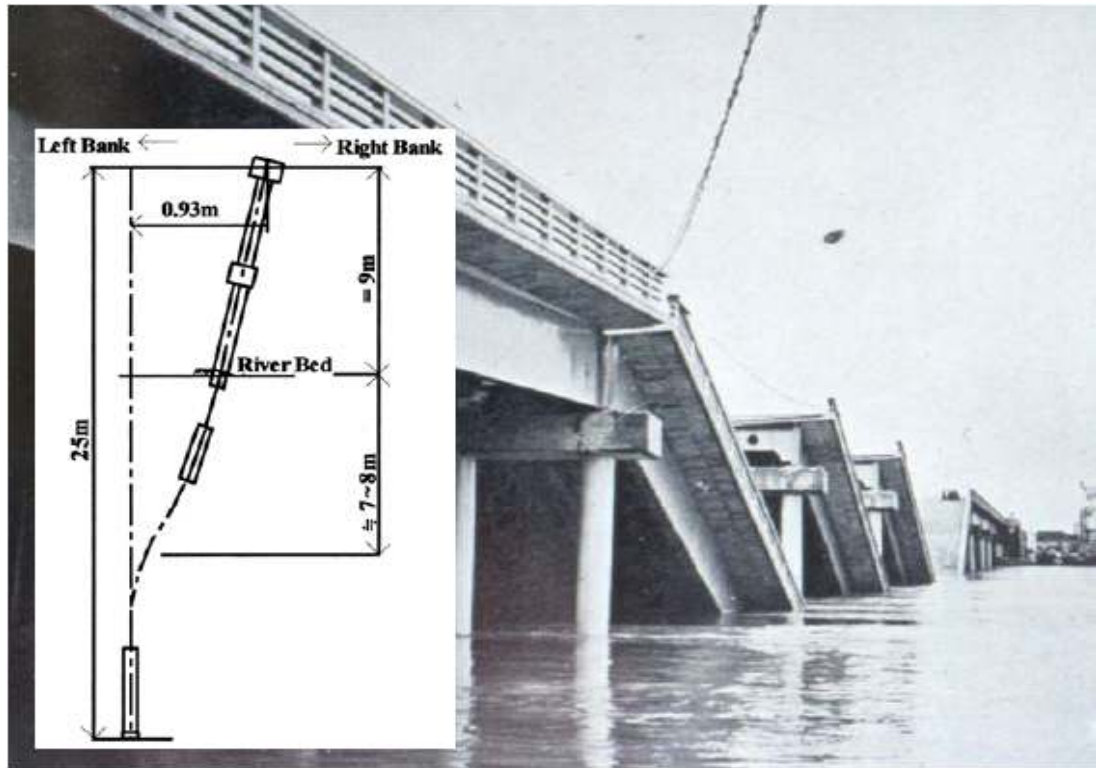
Showa Bridge Foundation's Lateral Movement (Yasuda and Berrill, 2000)
